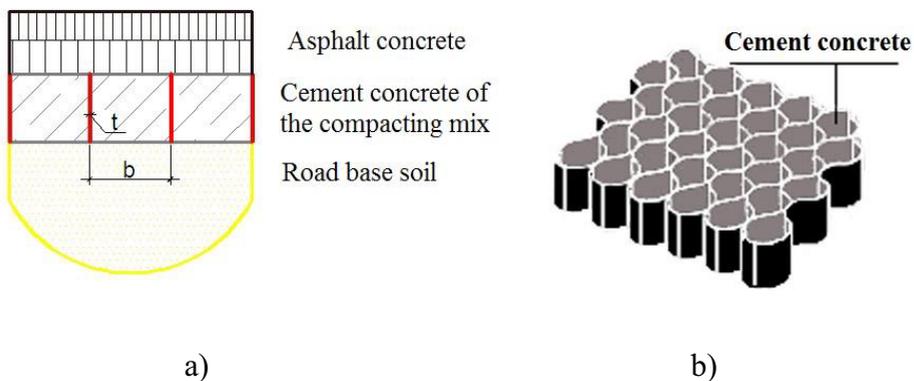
Roadway covering structure with the cement concrete, fragmented with the plastic geogrid:
